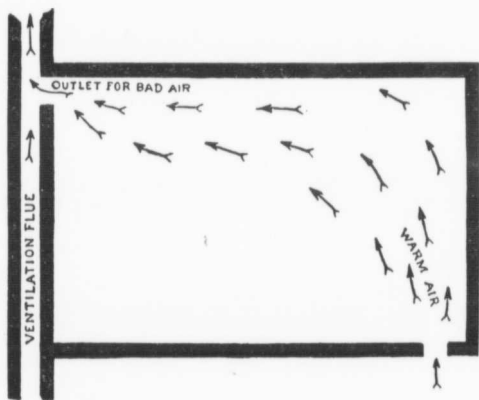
Inlet near floor: outlet near ceiling on opposite side: partial distribution
